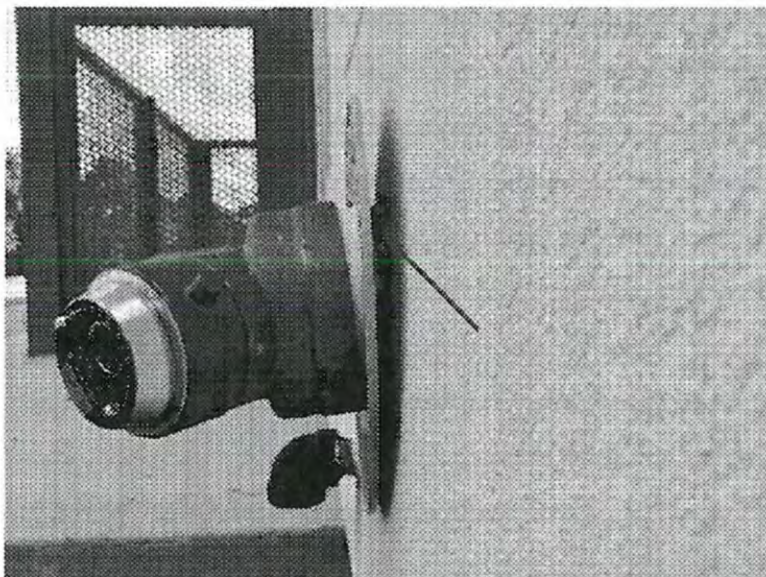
Fire hose spigot penetration not sealed at face of stucco on Building A.
